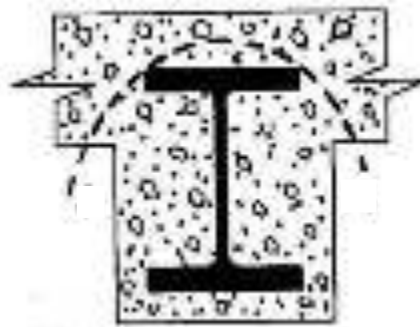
Cross-section of composite encased beam Johanson1975 [2].
